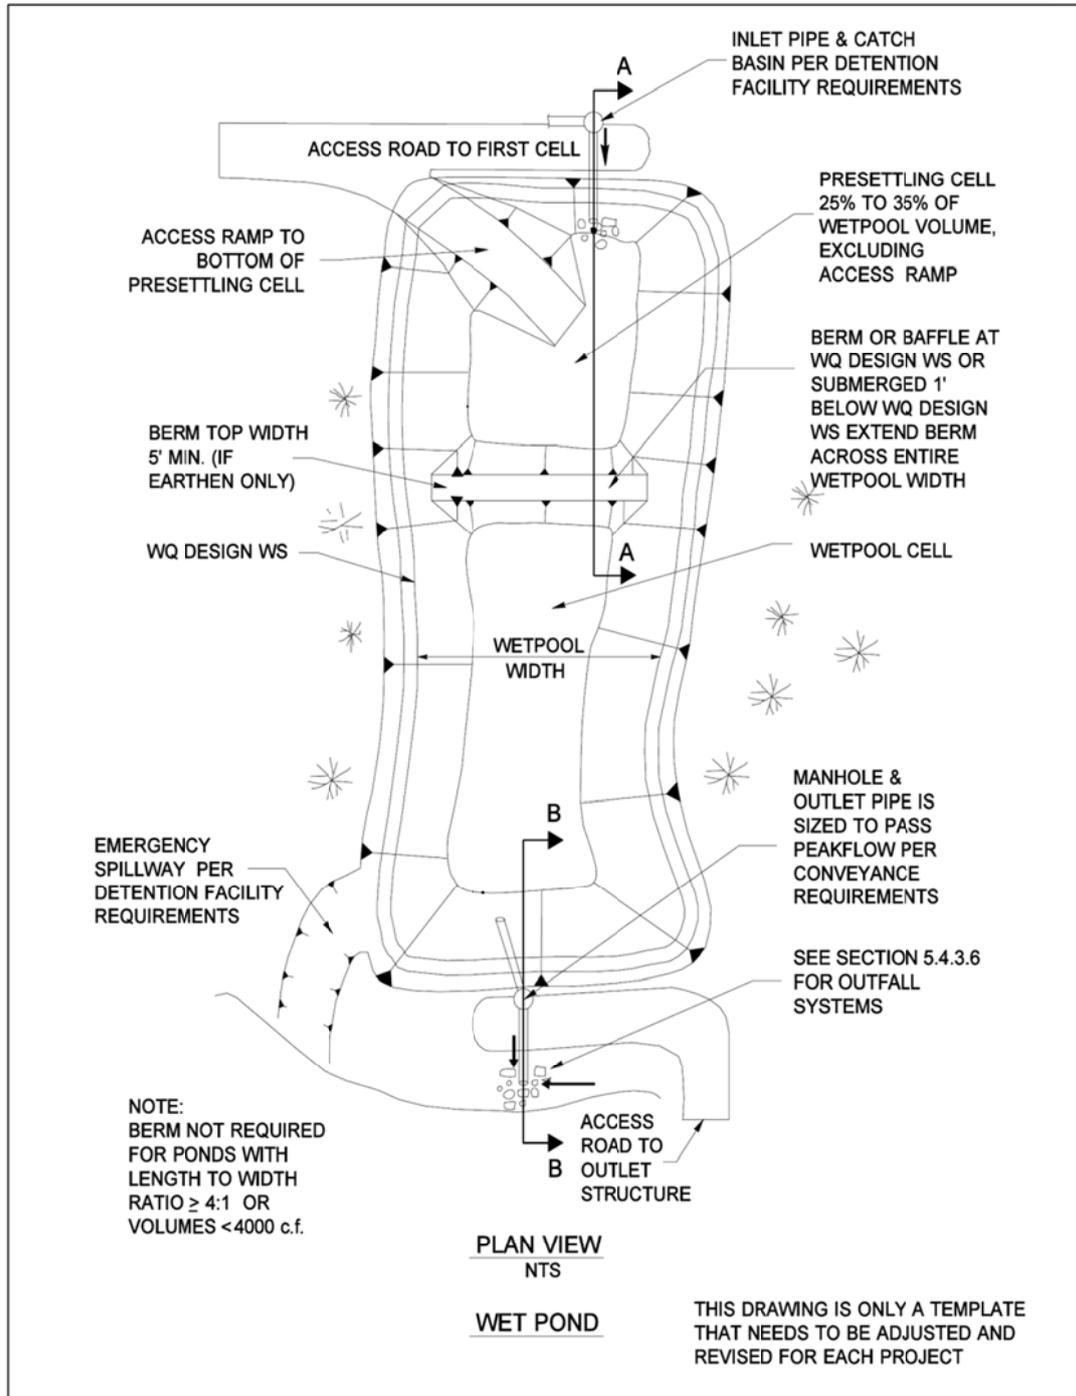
Plan view of a typical Wet Pond (WSDOP, 2011)
